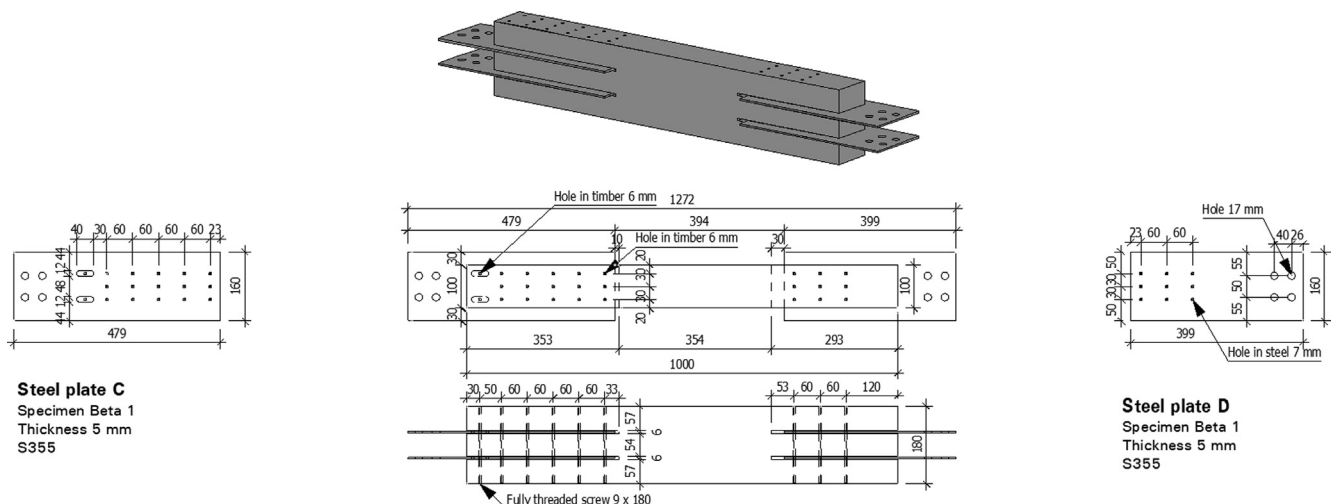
Layout of specimens Beta 1, specimens ID: B.1, B.2, B.3 (Glulam GL24h without confinement, fixing connection on the left, tested connection on the right).
